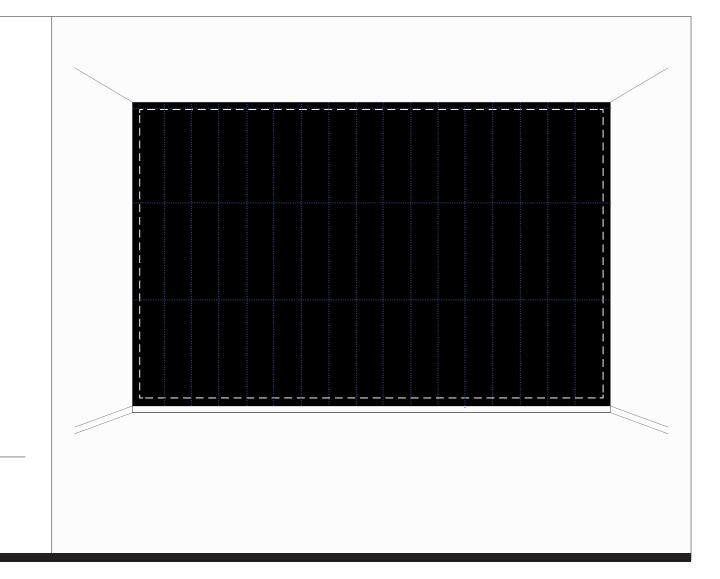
FIG B. IMPORTANT: If centered install is desired, mark center piece and measure out ends of wall to ensure both ends of wall coverings are equal before cutting excess.
